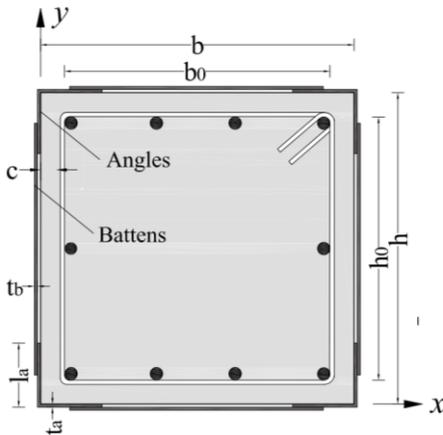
Typical configuration of the cross-section of a column reinforced by steel jacketing.
